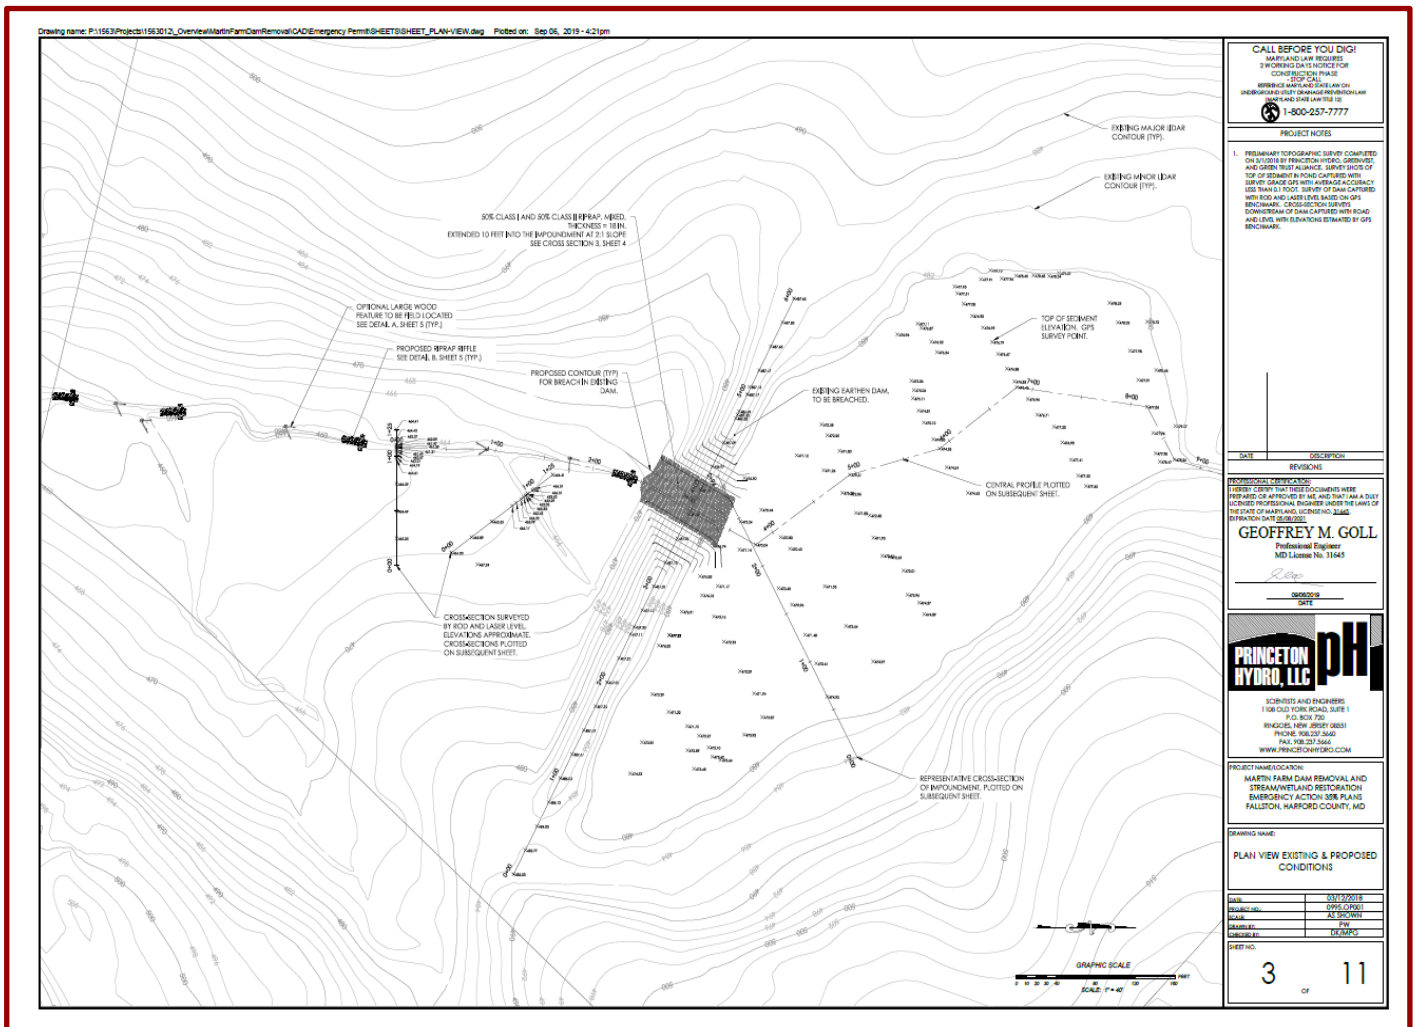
Construction plans for Martin Farm Pond Controlled Breach (MD Dam No. 531).
